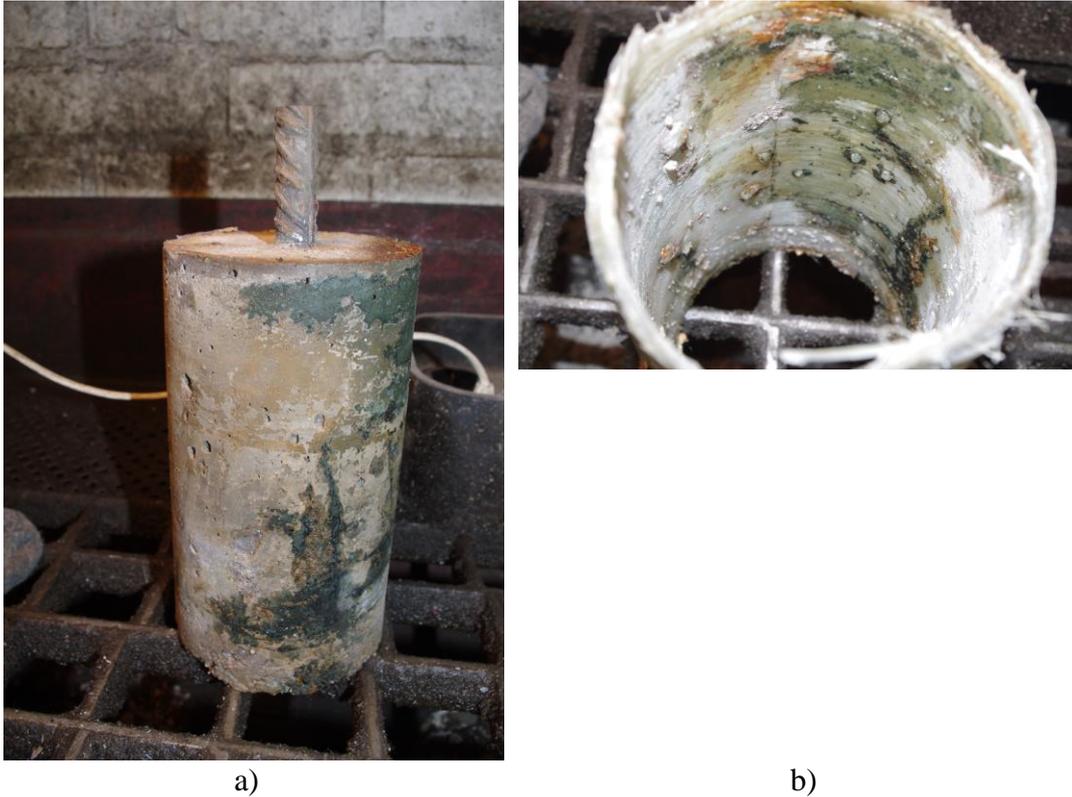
Bond failure mostly in epoxy, a) specimen C2, b) inside wrap C2
